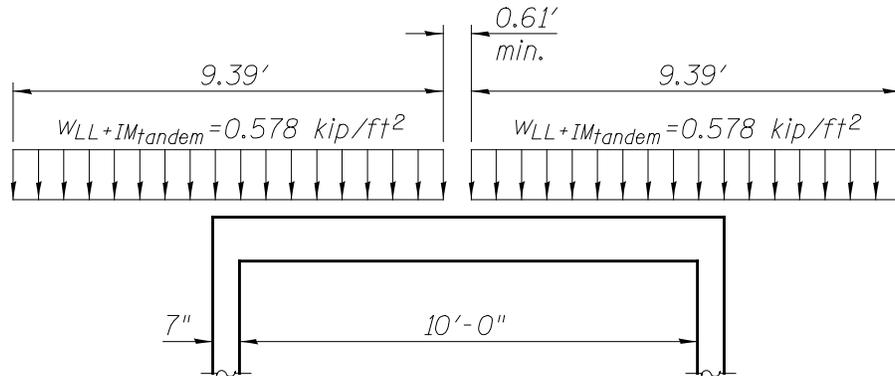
Worked Example 3 – Tandem Load (2 Lane)
